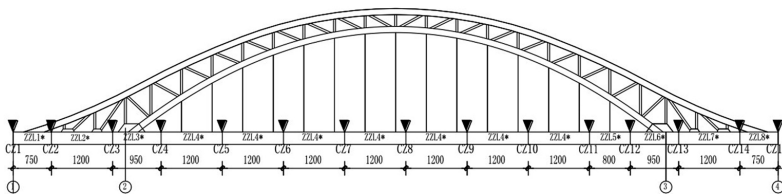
Longitudinal section diagram of the construction elevation of a segmental assembled beam
